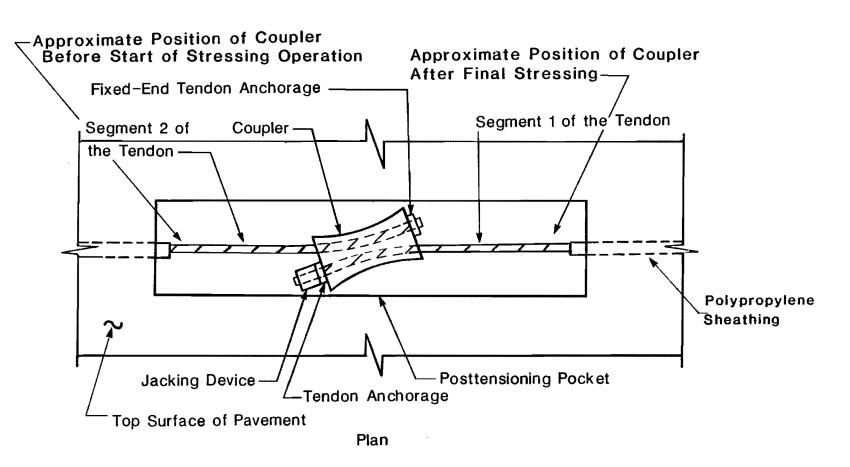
Plan view of the proposed pavement project developed by the Project 401 staff.
